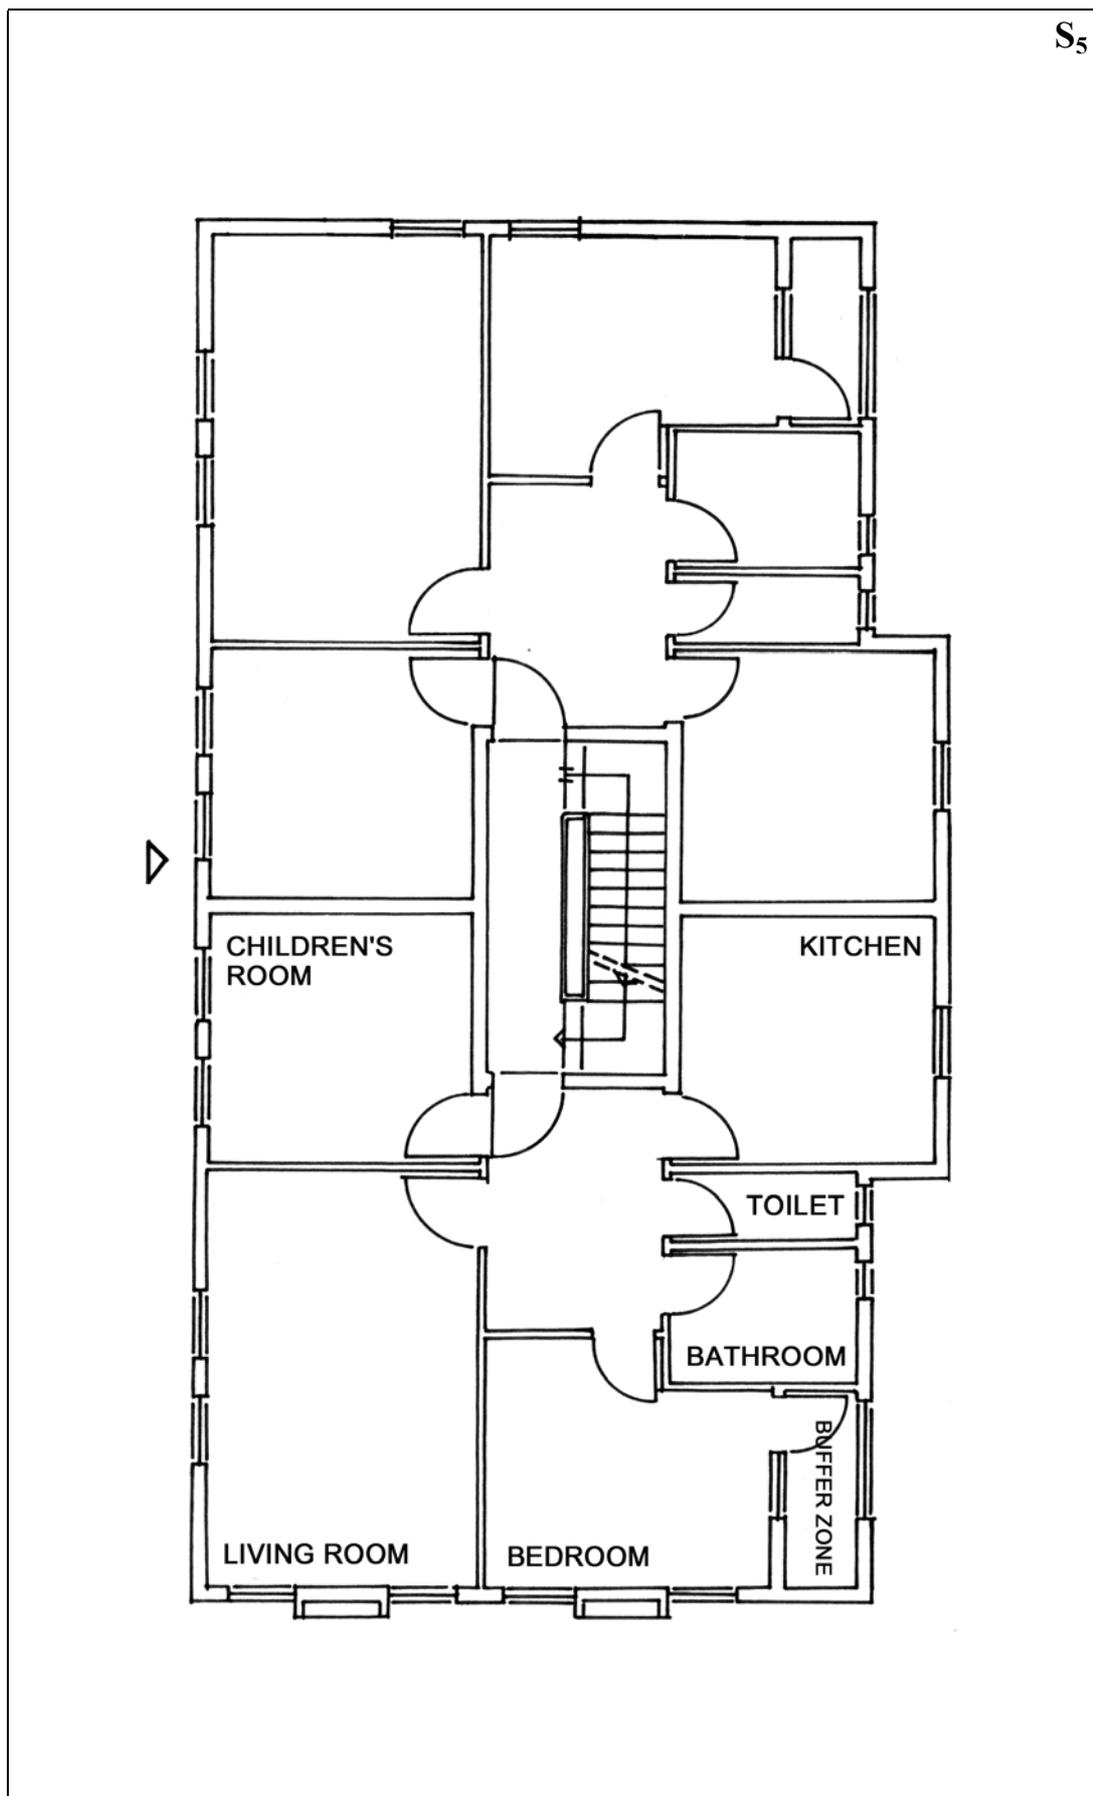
Plan of type S₅ dwelling (multi-storeyed housing facing mainly west); Scale 1/100
